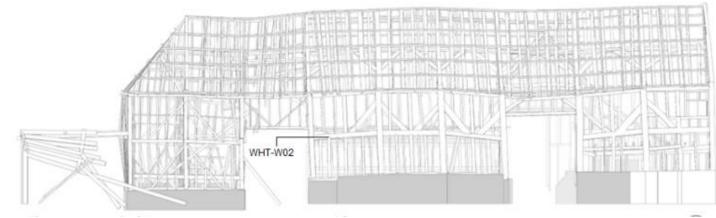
North elevation, showing the location of sample WHT-W02 (after ATD London Ltd)
